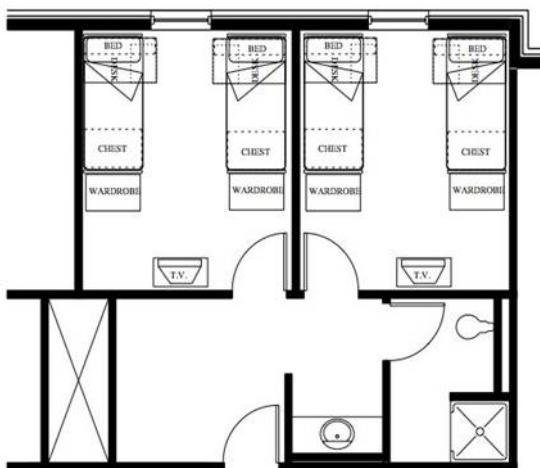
Floor plan of typical suite living unit being built in the Maple Hill project.
